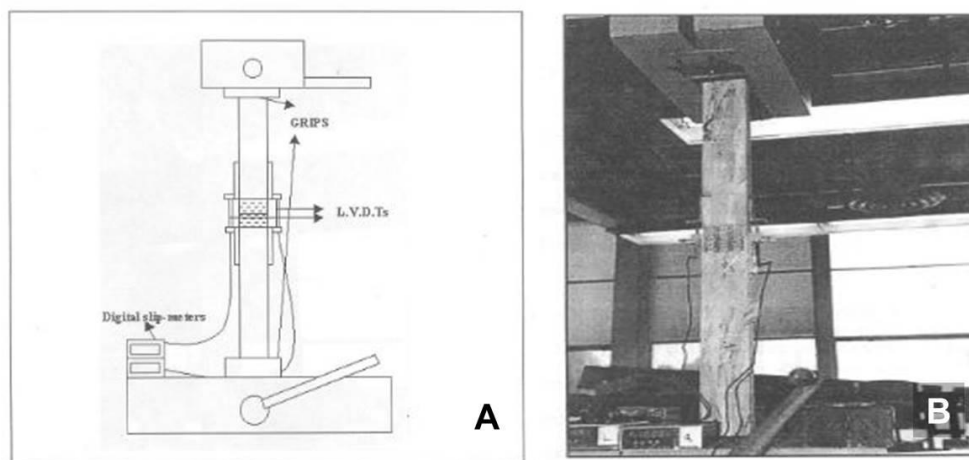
A. Diagram of tension test using Young machine, B. Tension casting of Timberstrand /Metal Plate specimens.
